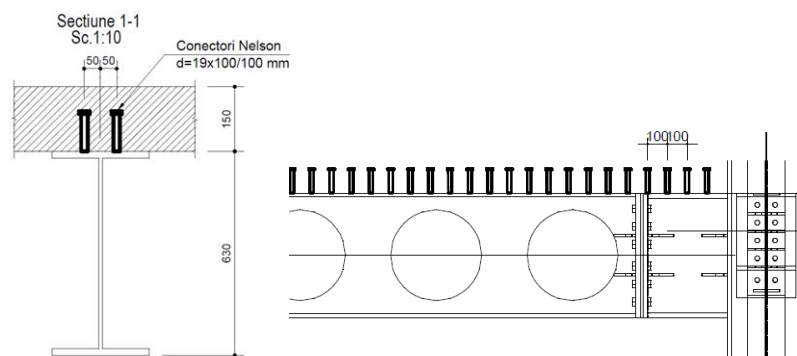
Composite HEA450 beam details: Cross-section; Beam-column connection detail.
